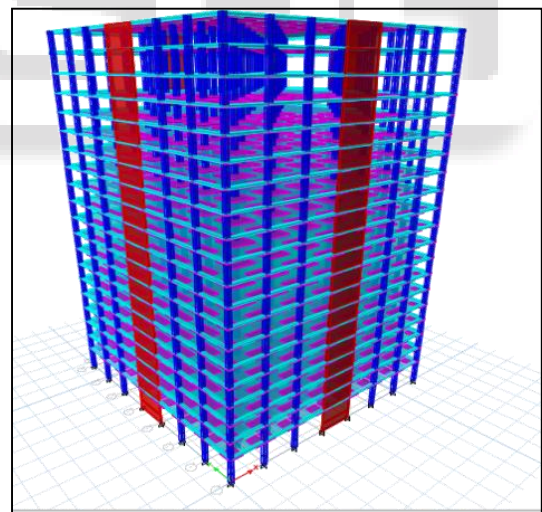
Rendered view of flat slab with shear wall structure.
